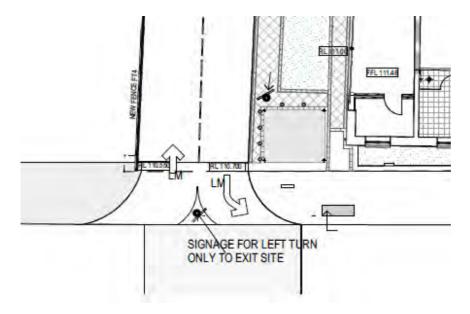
Access treatment illustrated on Kirkbride Architect's plans
